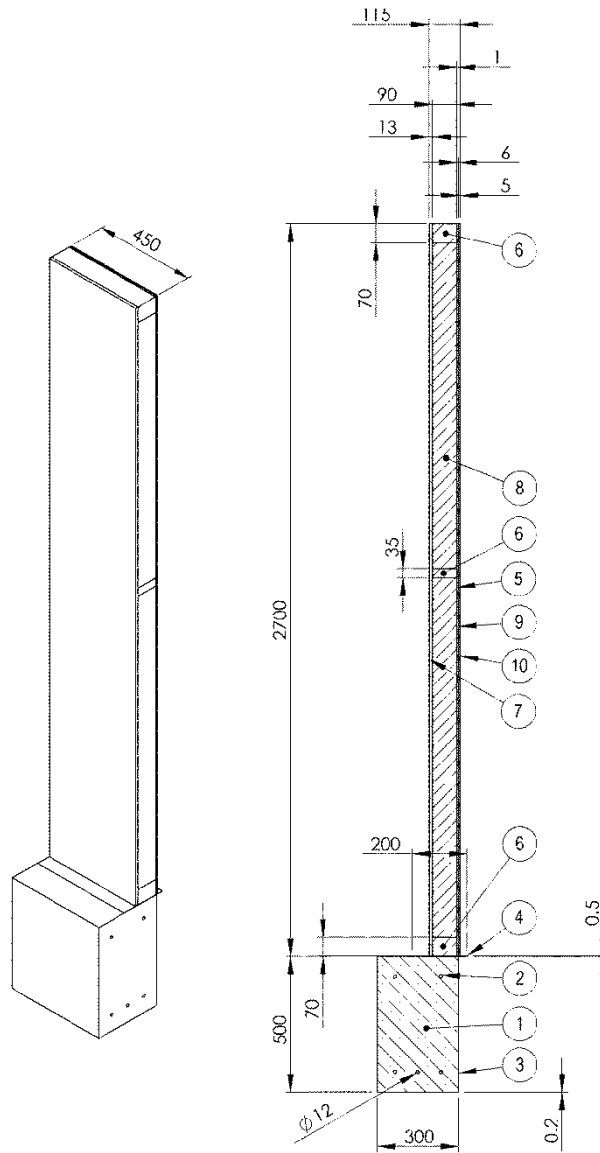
Timber Frame Cement Fibreboard Clad Wall Module
